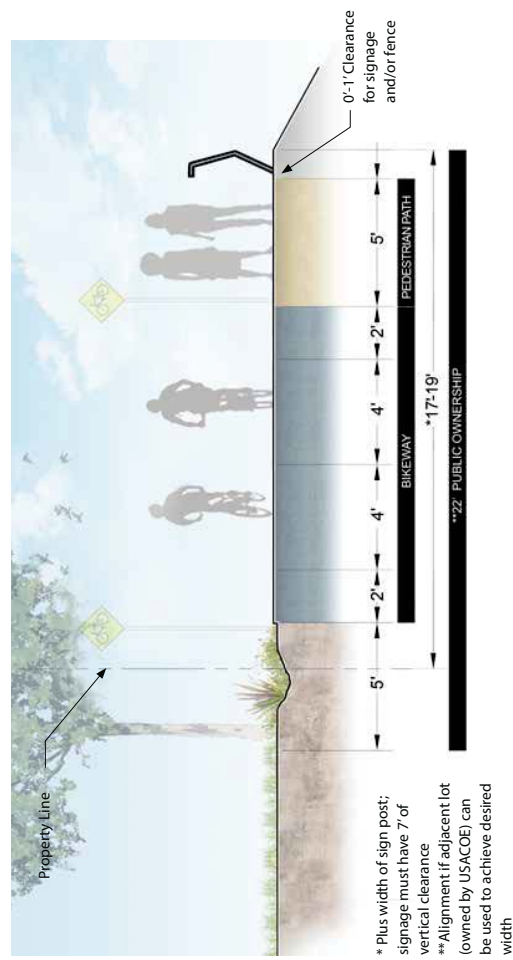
Metro Orange Line Busway to Balboa Boulevard - Typical Cross Section
